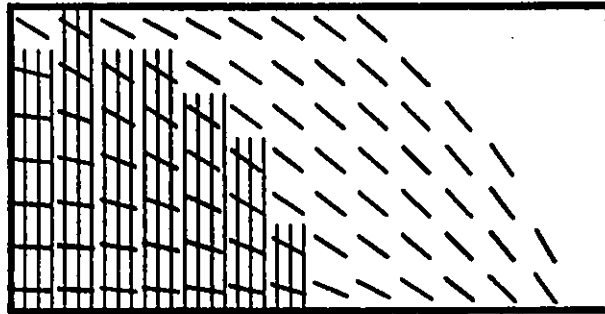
Wall 1 effect of horizontal reinforcement of wall behavior
